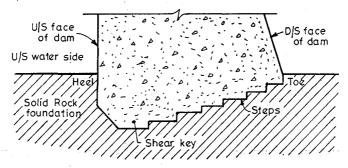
Stepping of dam foundation and provision of shear key.
